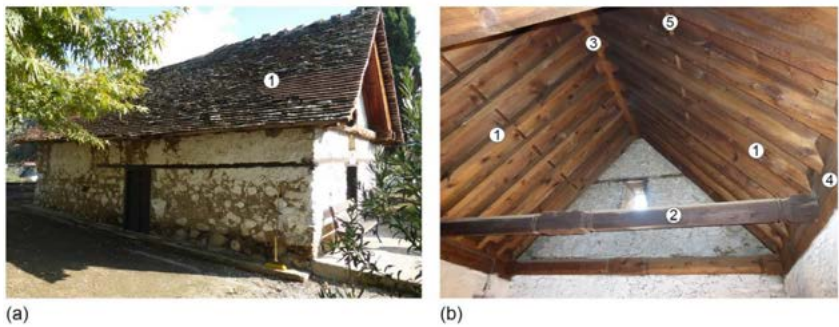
(a) Saint Nicholas Church, a.1. Existing gable roof and (b) Existing timber roof construction of the church, b.1. Rafter, b.2. Rafter tie, b.3. Ridge, b.4. Wall plate, b.5. Batten
